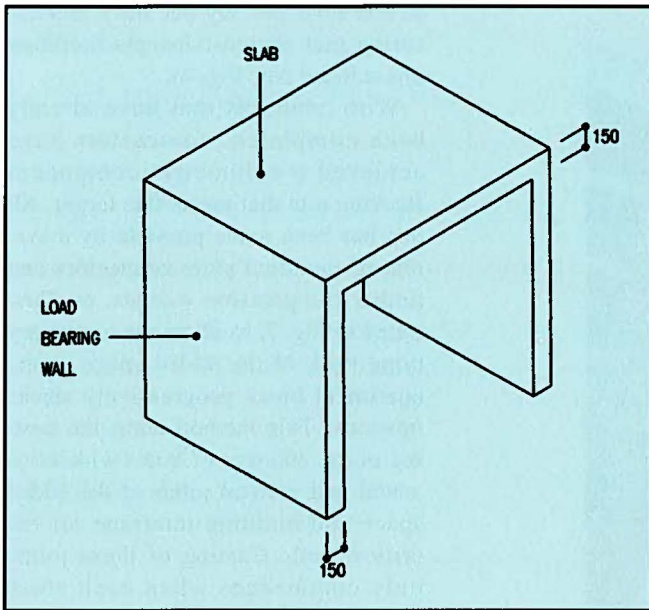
System 1 basic N Volumetric consisting of two walls with linking slab element.
